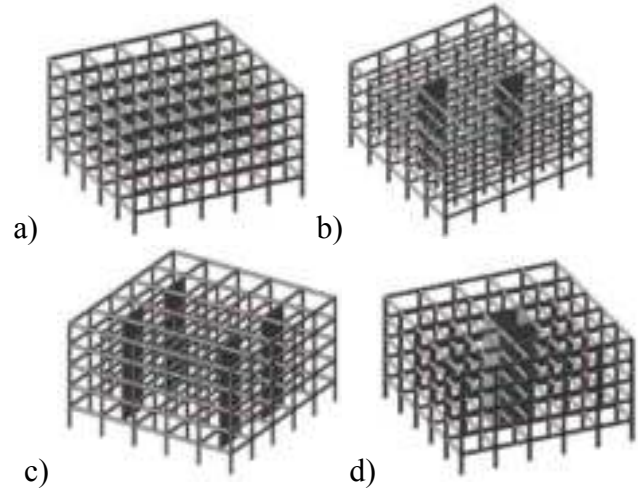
3D finite element models obtained (for the 5 storey variant): a) without rigidity elements; b) 2 shear walls; c) 4 shear walls; d) rigidity core
